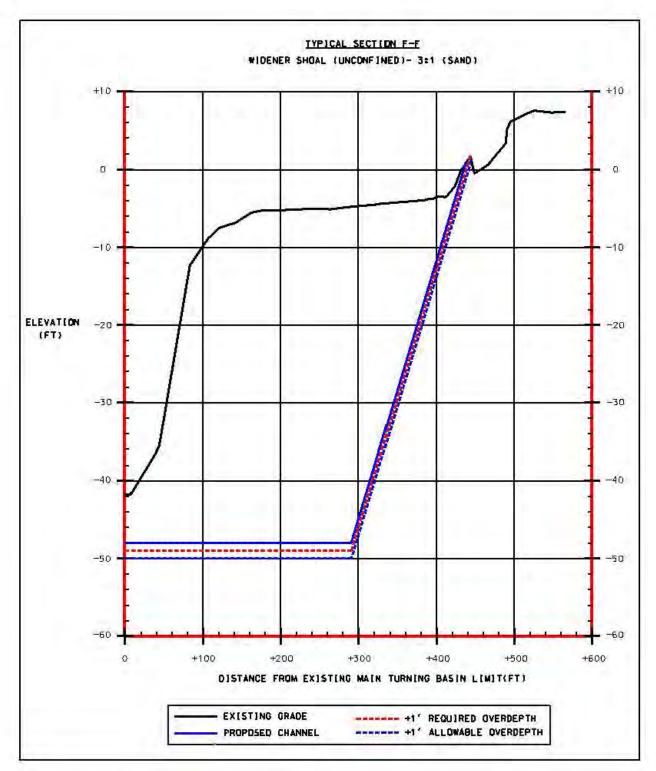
Typical Cross-Section: Widener (Unconfined)
